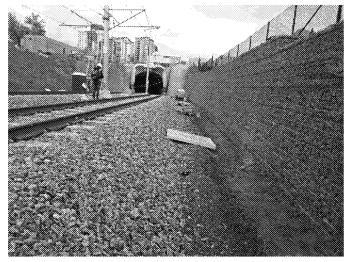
(left): loss of ballast shoulder approaching main tunnel from Pimisi station. Note the storing of materials and plant at this location.
